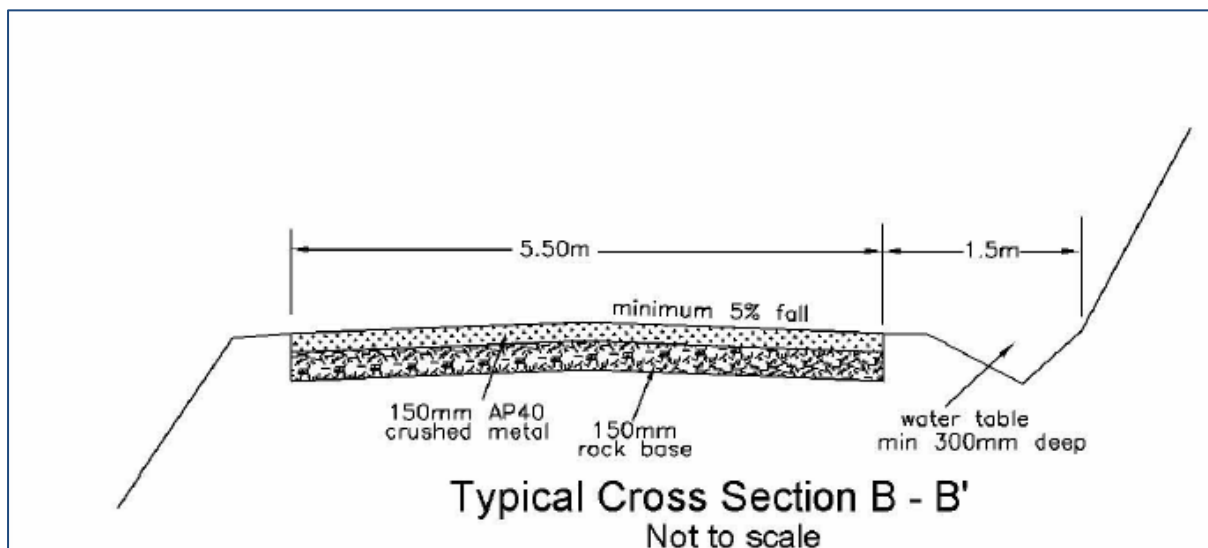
Typical cross section of upgrade to existing Toko Mouth Domain Road formation south and east of the site.
